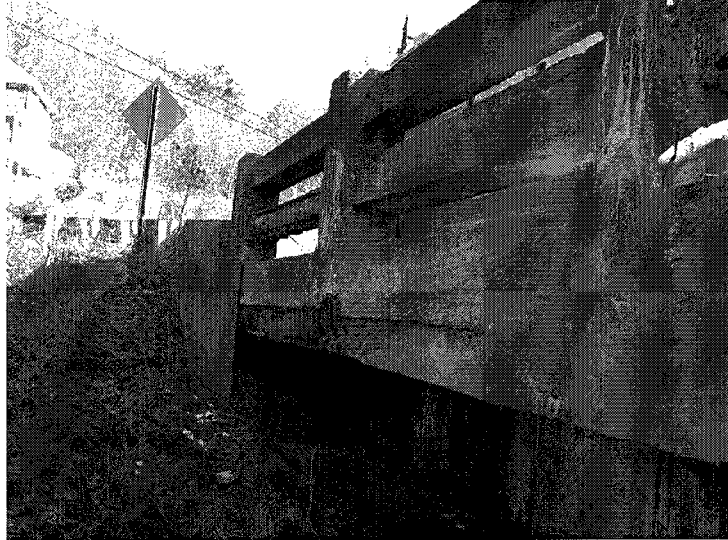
West Parapet @ northerly end; Note the spalled condition below the horizontal construction cold joint.
